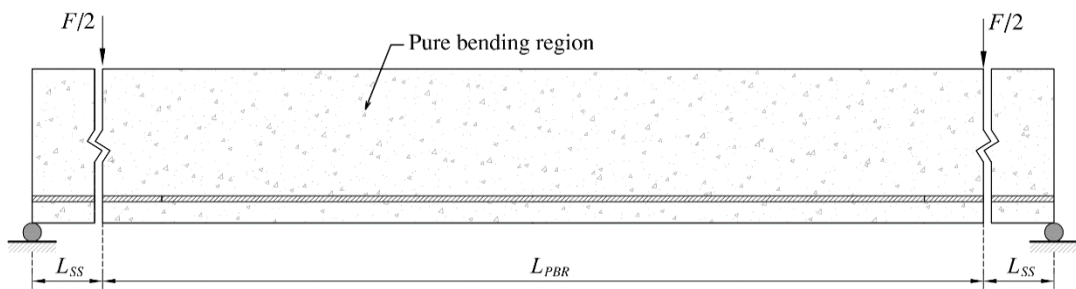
Reinforced concrete beam subjected to four-point bending load configuration
